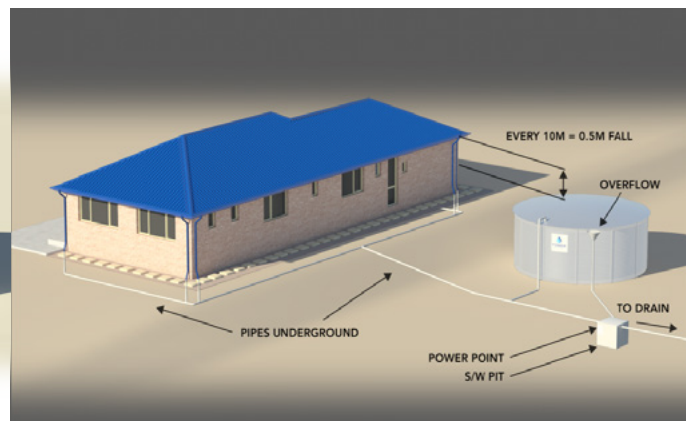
Plastic pipes, running from the downpipes to the water can, can also be used but should be sunk underground to protect them from damage from radiant heat
